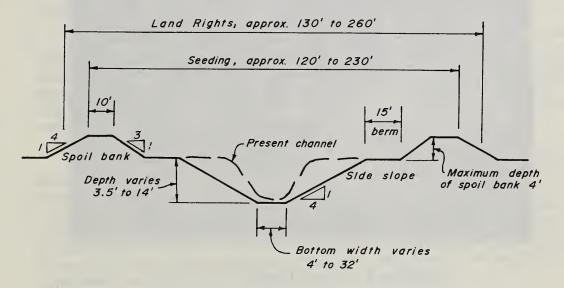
Typical Cross Section of Planned Channel Without Adjacent Road.
